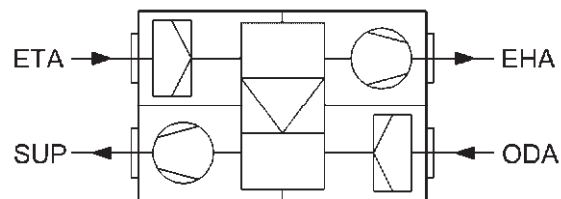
Example of Air handling unit with exhaust air/ supply air heat pump
